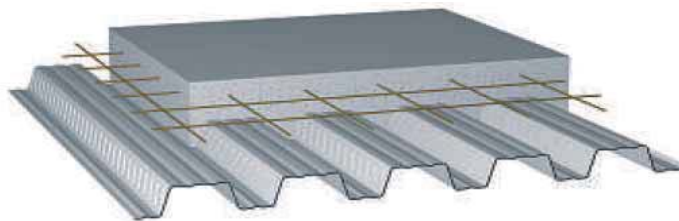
Cofraplus floor (Floor systems guide,ARVAL,2013)
